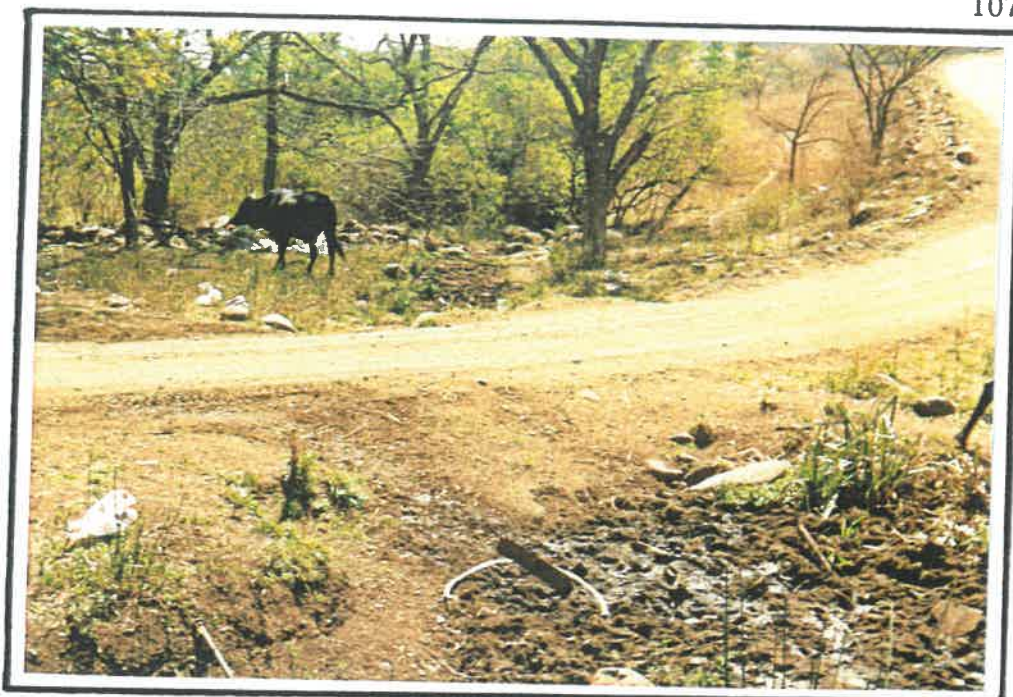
The low level bridge, situated on the only access road to Mpumelelo settlement. It is not effective in preventing flooding of the road.
